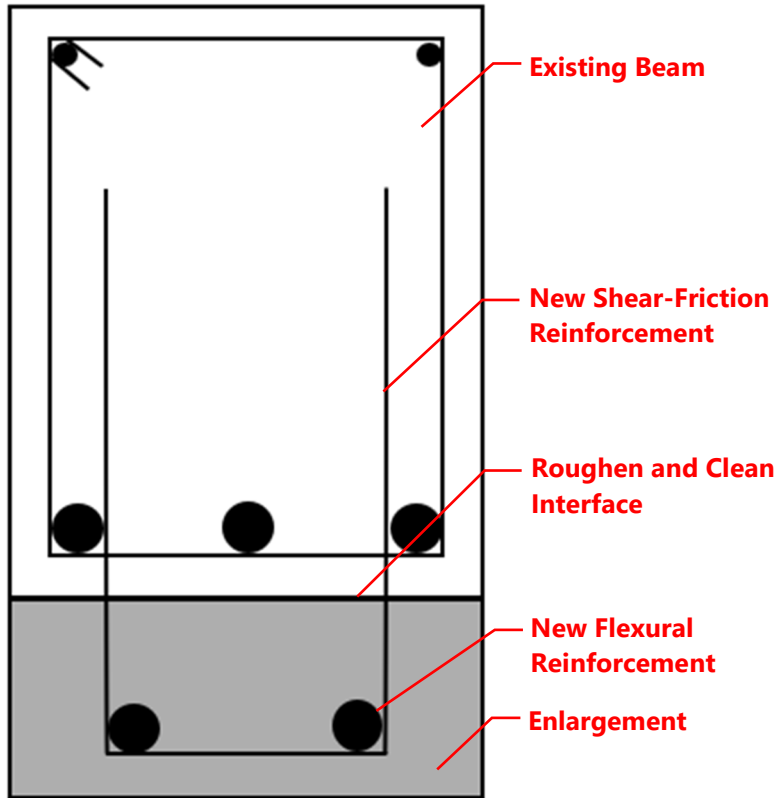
Section view of a reinforced concrete beam which is enlarged to increase flexural resistance
